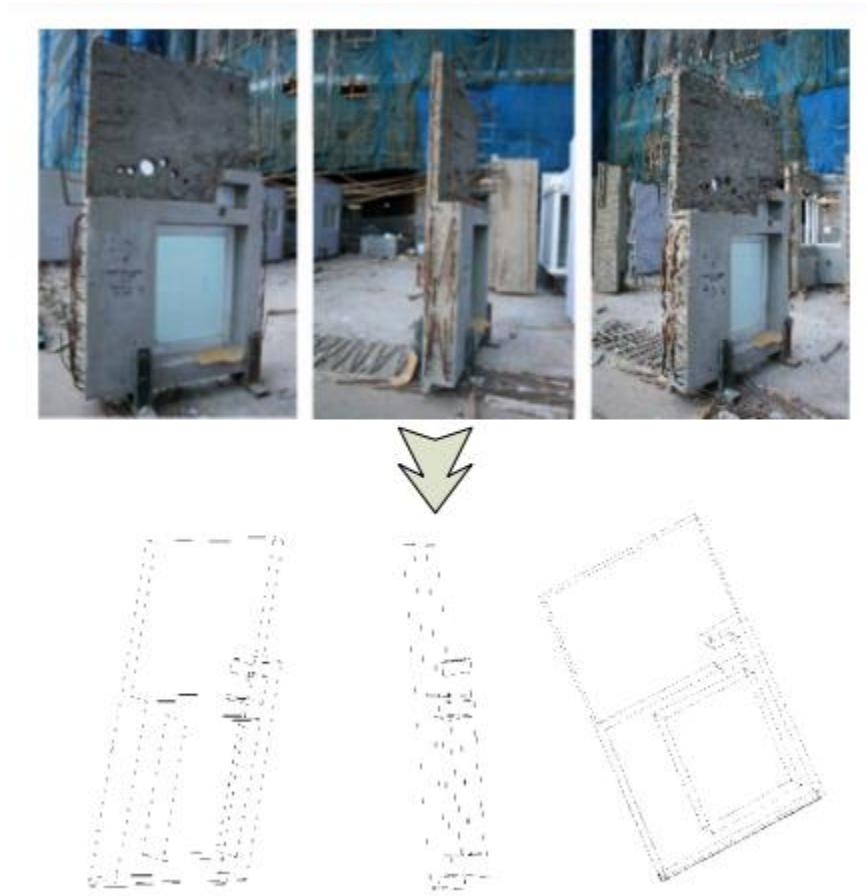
Photogrammetry for obtaining 3D models of construction elements (source (Dai, F., Lu, M., 2010))
